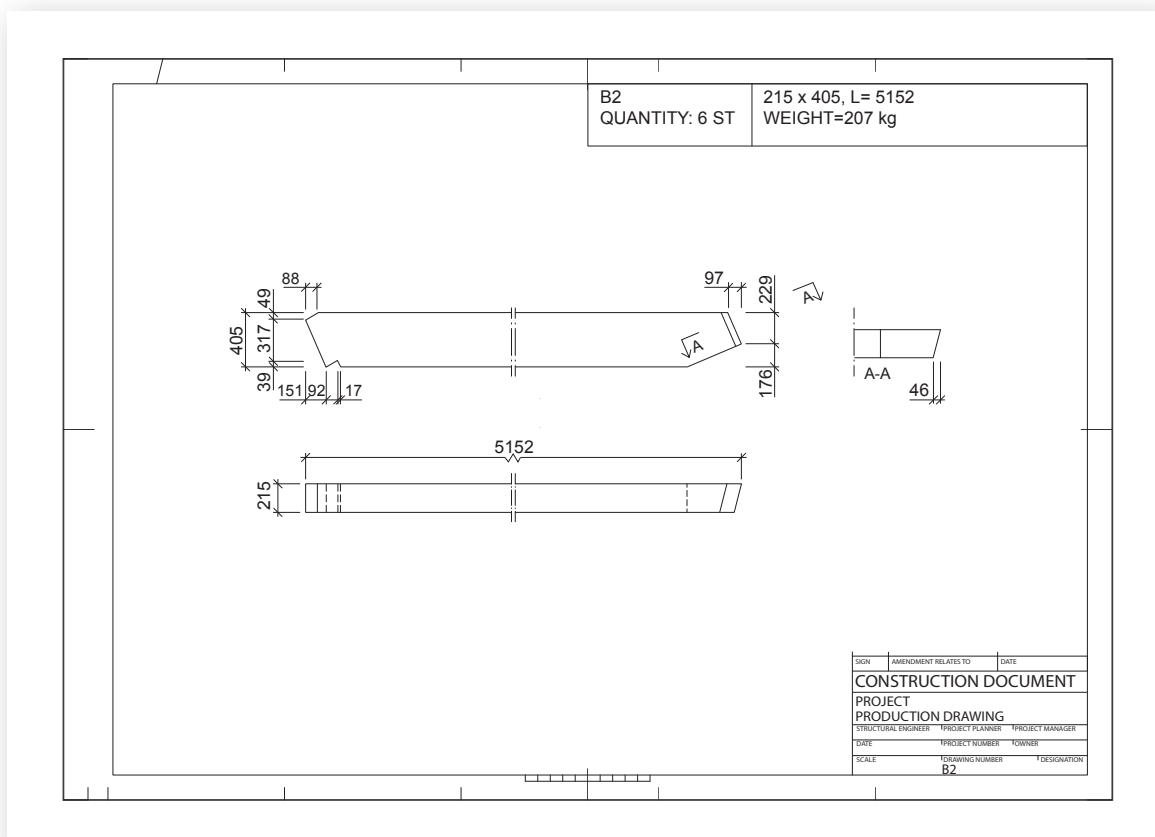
Example of a production drawing for the finishing of a glulam beam
